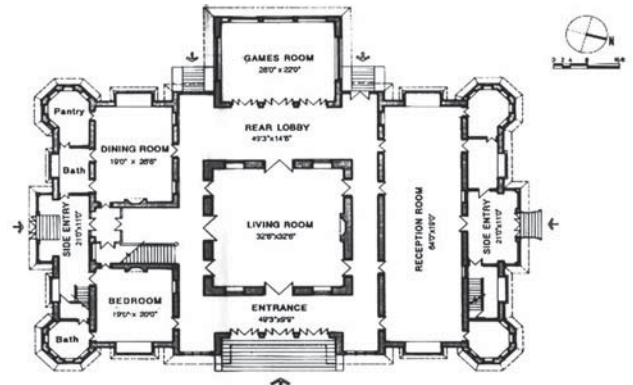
Ground Floor Plan of Mohatta Palace, Karachi.
